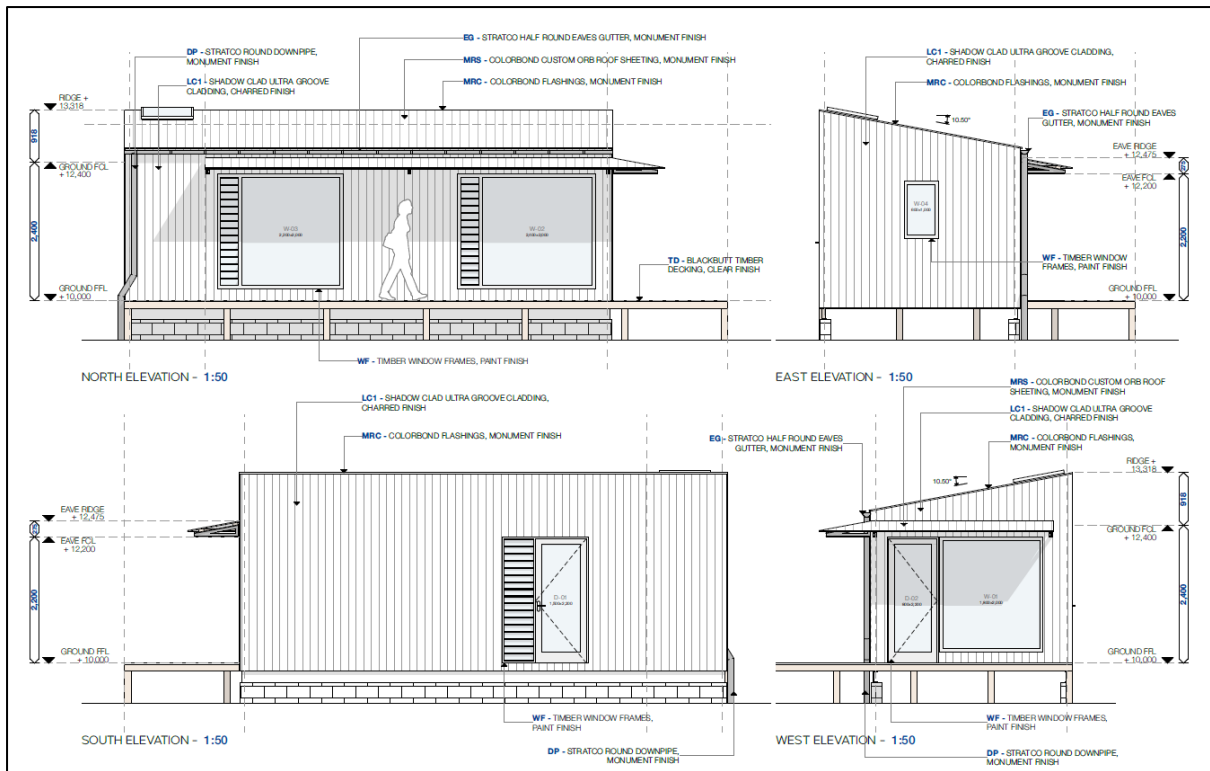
Elevations of proposed development (Source: Studio Find, 2024)
